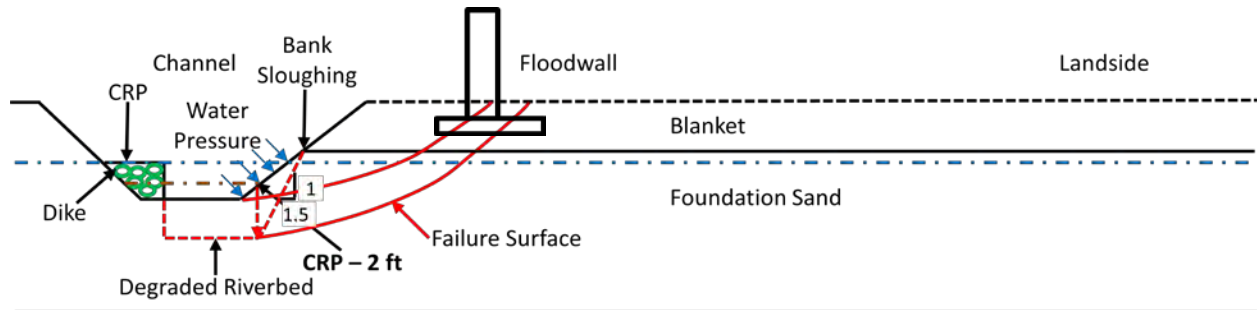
Foreshore Stability of Typical Levee Floodwall Section
